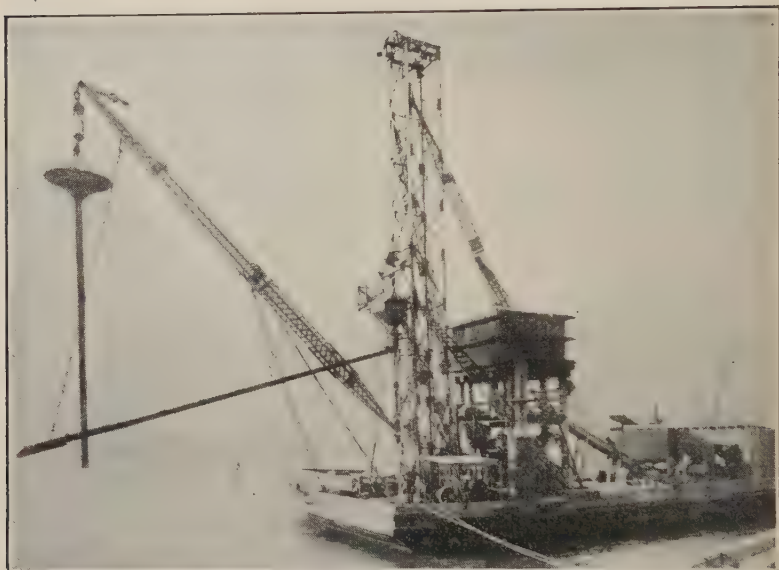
Mixing and placing plant for underwater concreting operations. A 1-yard mixer was mounted on the barge with an overhead bin, the mixer discharging directly into the bucket of the steel tower. A boom was mounted on the tower supporting a feed chute from the tower and also supporting a tremie chute with feed hopper. The end of the chute from the tower discharged directly into the tremie chute when it was lowered into the water, and the feed chute was made adjustable so it could be moved forward and backward as the position of the tremie chute changed. Tackle was arranged on the boom for raising and lowering the tremie chute.
